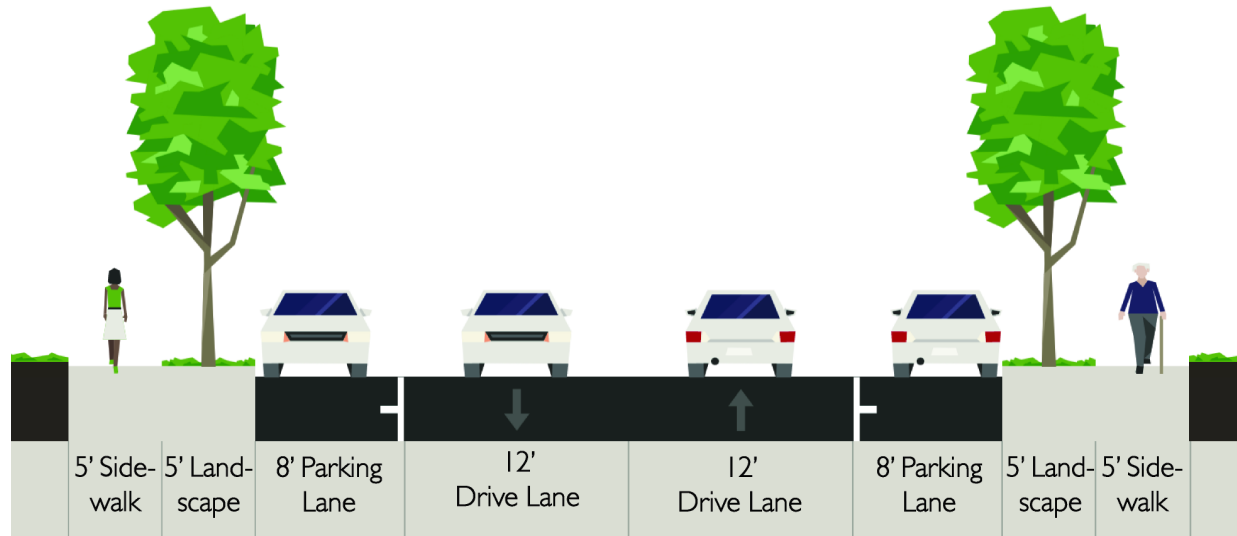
Cross Sections for Lichtenberg and Hawthorne Avenues (60-foot Right-of-Way)
